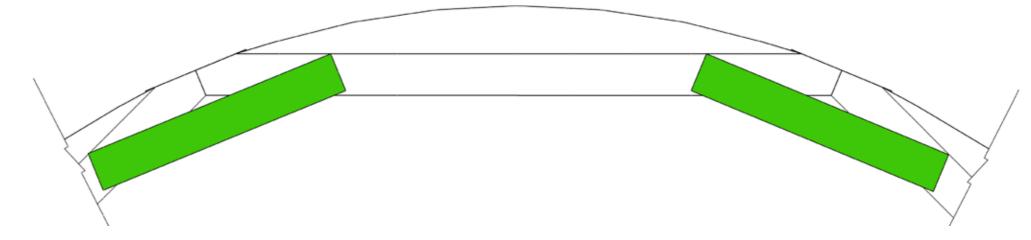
1:20 post -fire measured survey - Horizontal rafter wall ties (M) in detail plan view (2020) © SLHA
